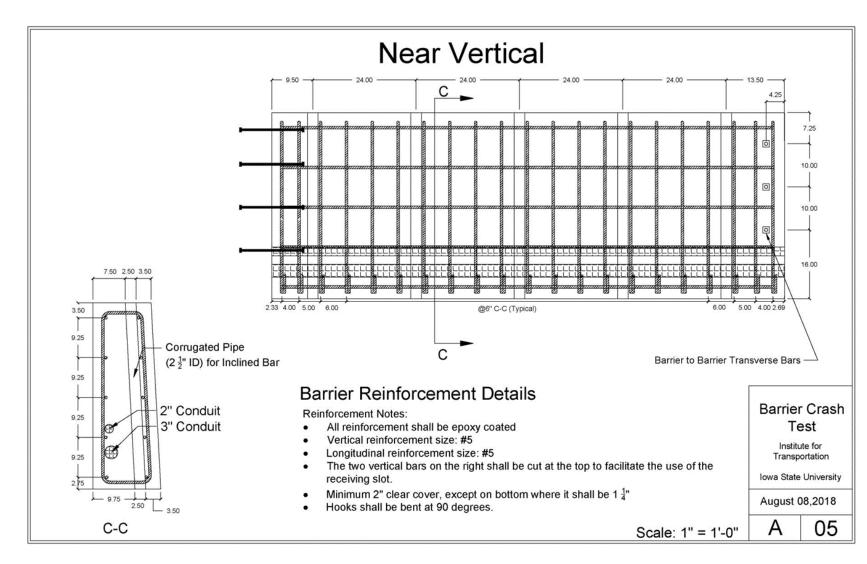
Near-Vertical Barrier Segment, Reinforcement Details [5]
